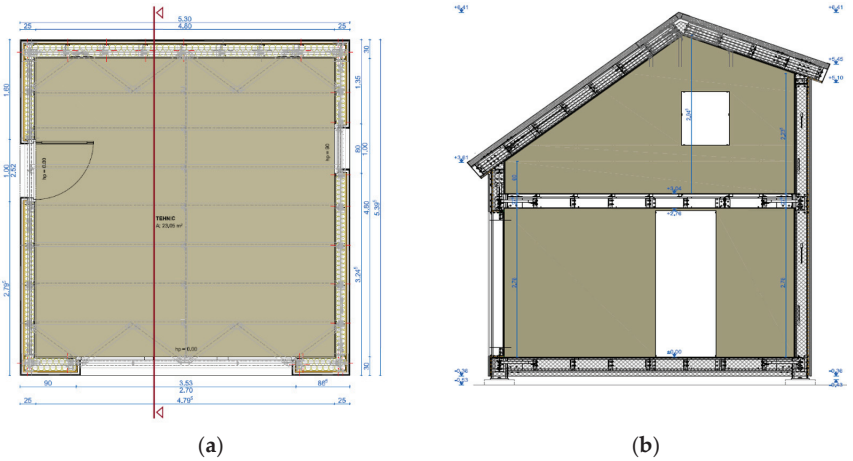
Detailed view of the building envelope: (a) ground floor layout; (b) vertical cross-section.
